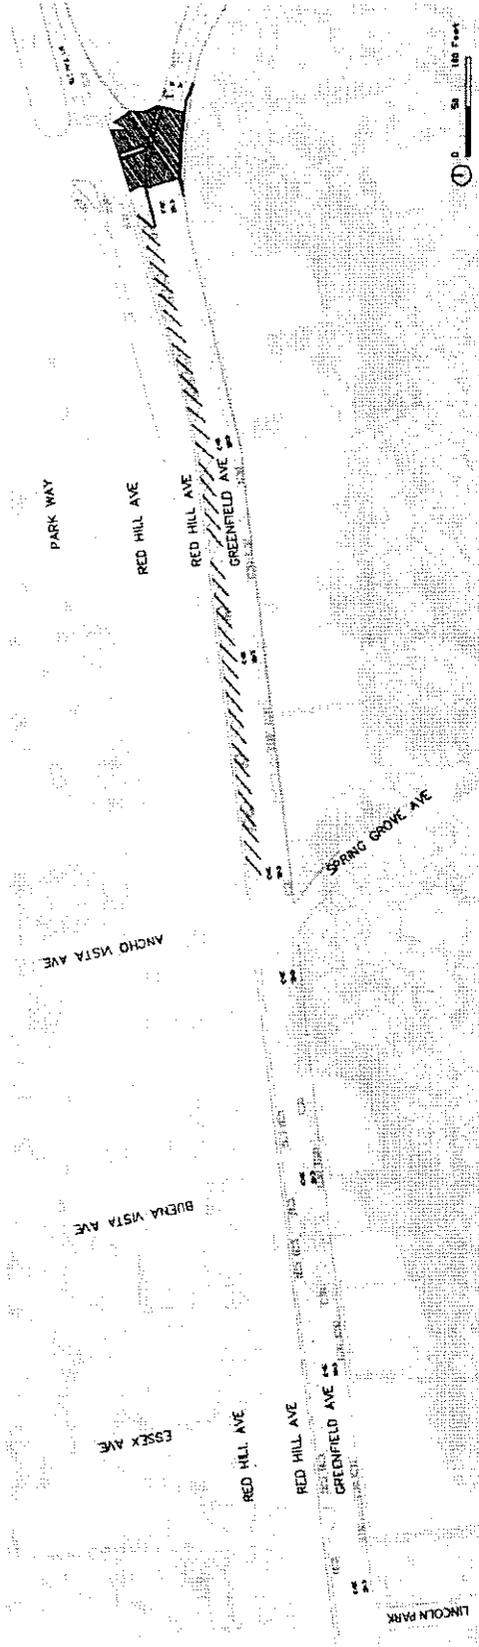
Plan View of Proposed Improvements for Project 10: Red Hill Avenue/Greenfield Avenue (Lincoln Park to Hilldale Drive) (Short-Term Improvements)
